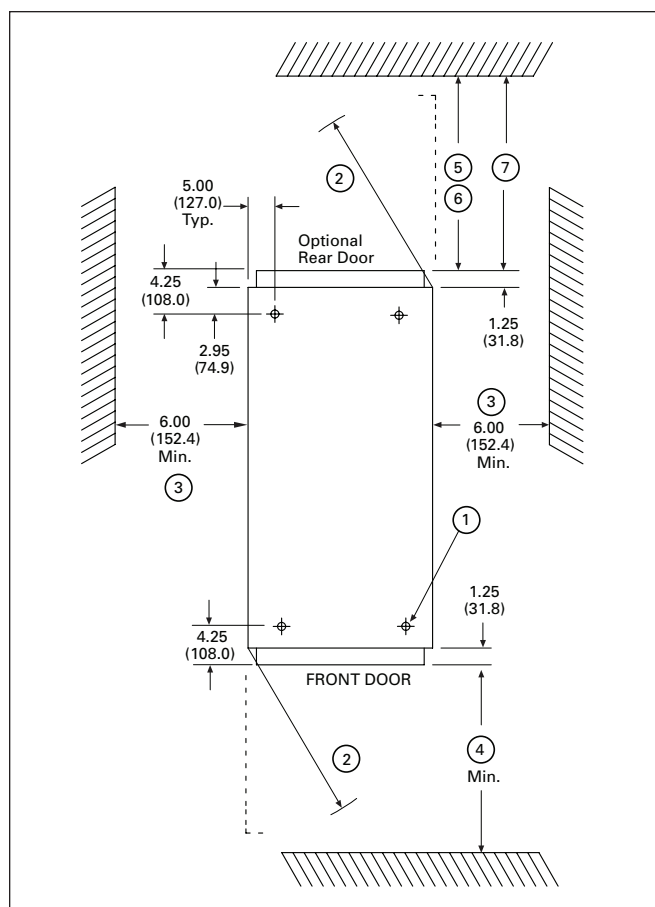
Typical Anchor Plan—5–15 kV Indoor or Outdoor
